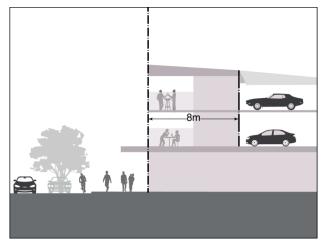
Permitted parking areas to upper floors for commercial or mixed use development
